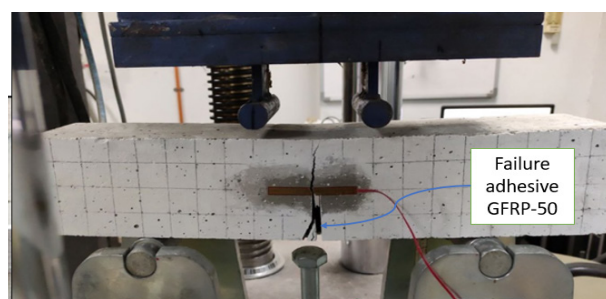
illustrates the failure mode of the strengthened beam. Testing has identified multiple failure modes, such as interfacial and adhesive failures. An adhesive mode failure was detected in specimens bonded with a small section of GFRP sheet. An interfacial mode was detected in specimens reinforced with a larger surface area of the GFRP sheet. In contrast, specimen GFRP-50 cracks not at the mid-span and has an average ultimate load of 8.58 kN, while specimen GFRP-100 cracks at the mid-span of the beam and has an average ultimate load of 14.84 kN.
